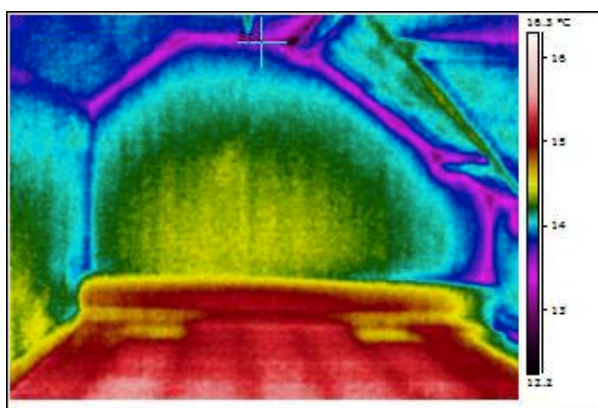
Room S19, attic space. The image shows thermal bridges at the junctions between the external wall and roof in the second floor.
